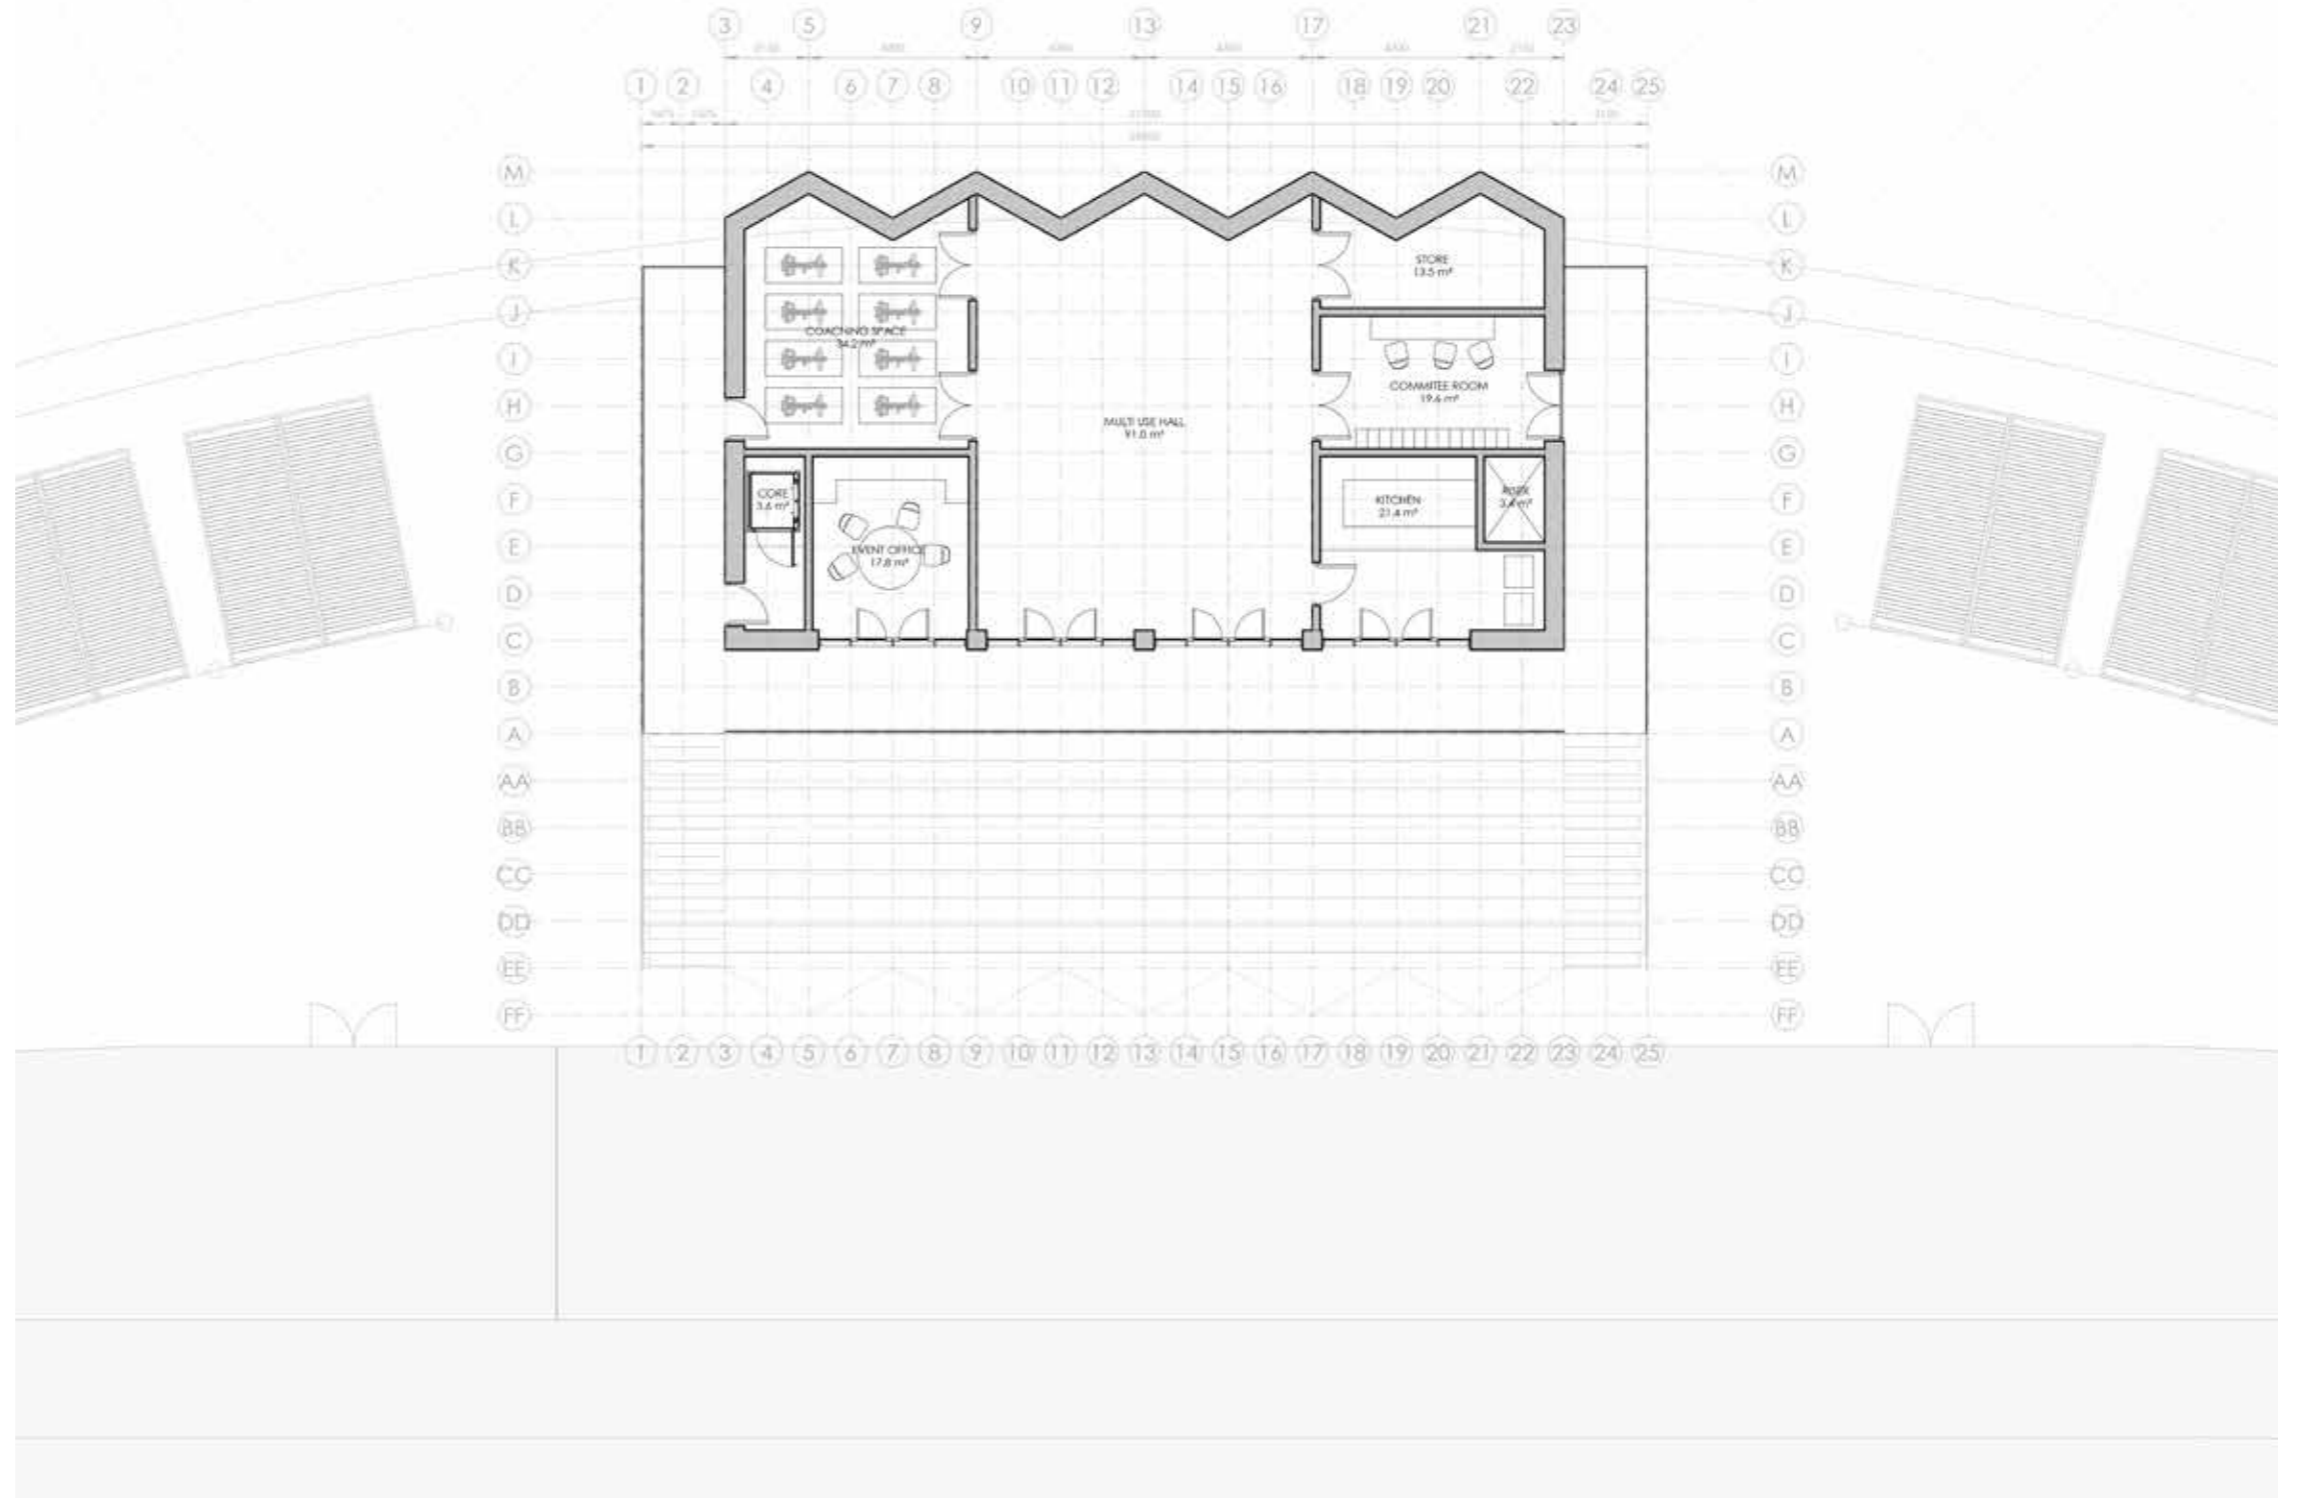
(above): Extract from drawing 3617-FBA-00-XX-DR-A-01100\_FIRST FLOOR PLAN
